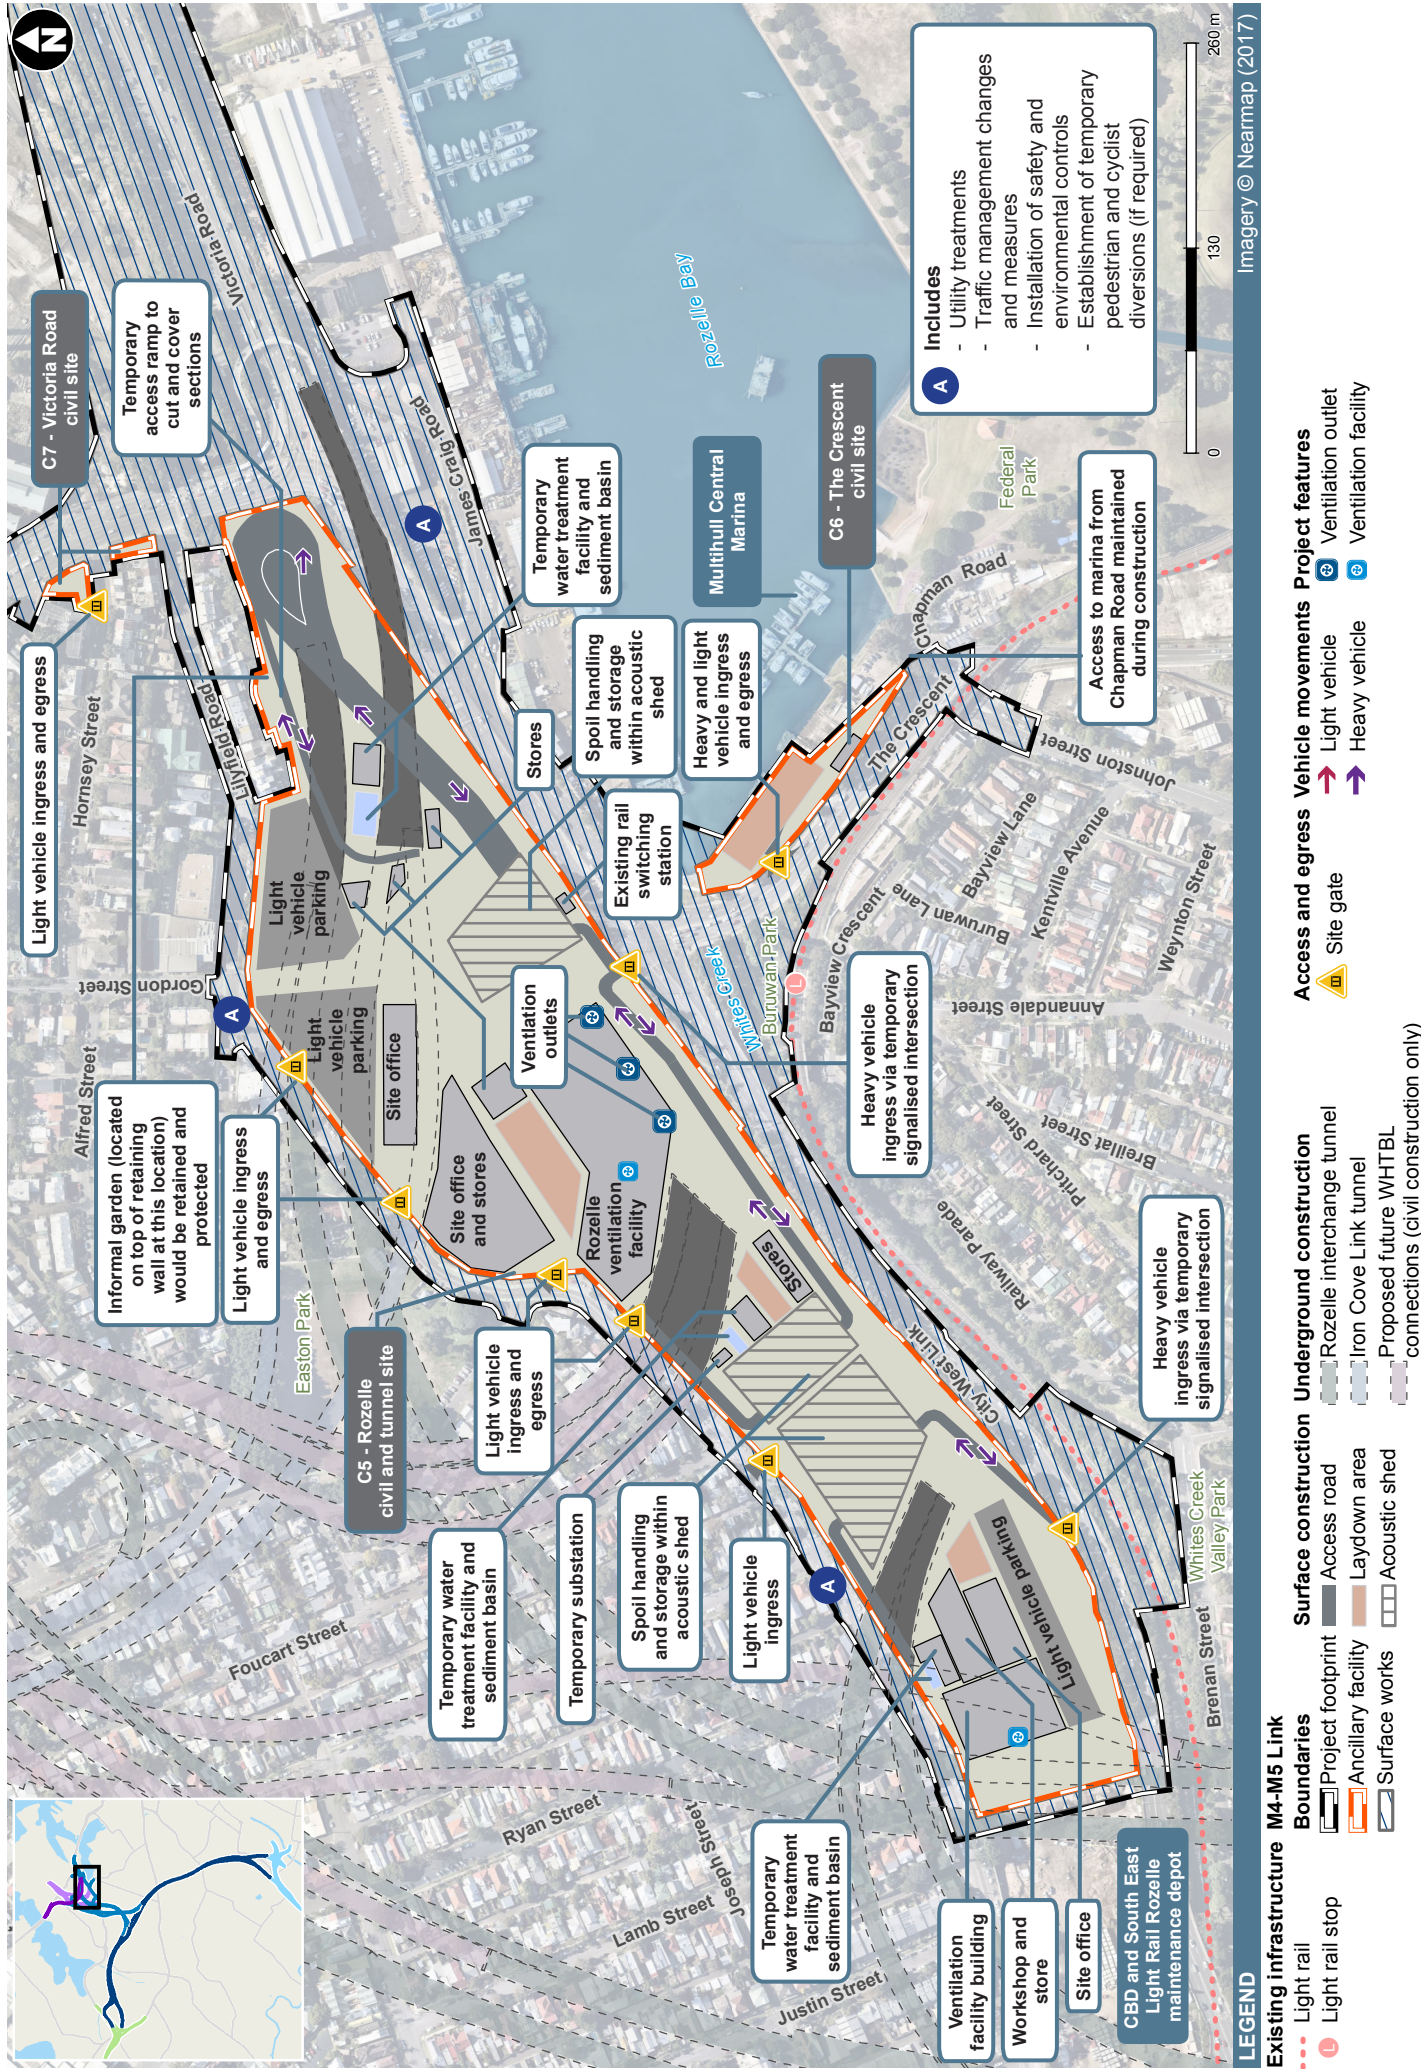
Indicative Rozelle civil and tunnel site, The Crescent civil site and Victoria Road civil site (C5, C6 and C7) layout
